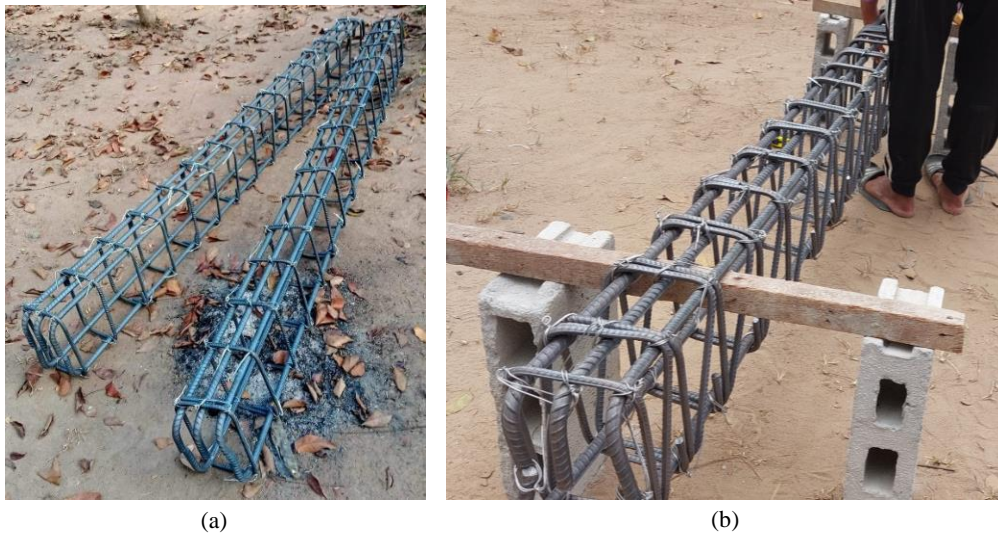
a) Traditional Stirrup in BN and b) Rectangular Truss System in BTR-150
